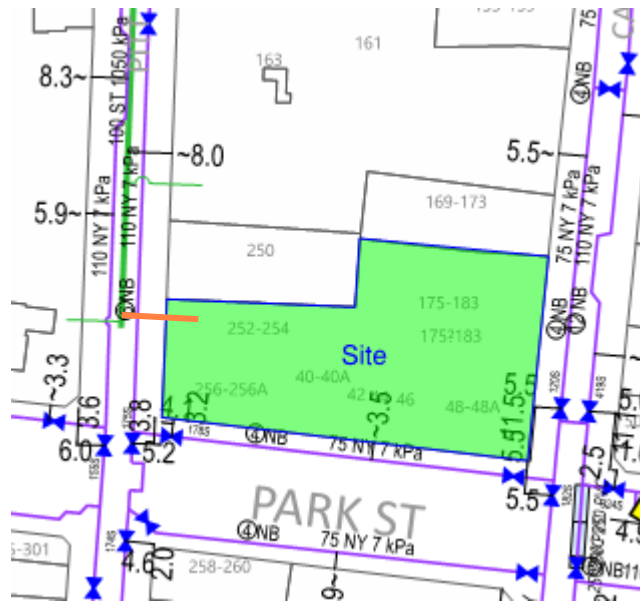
Site Gas Connection (via Jemena Asset Maps)
